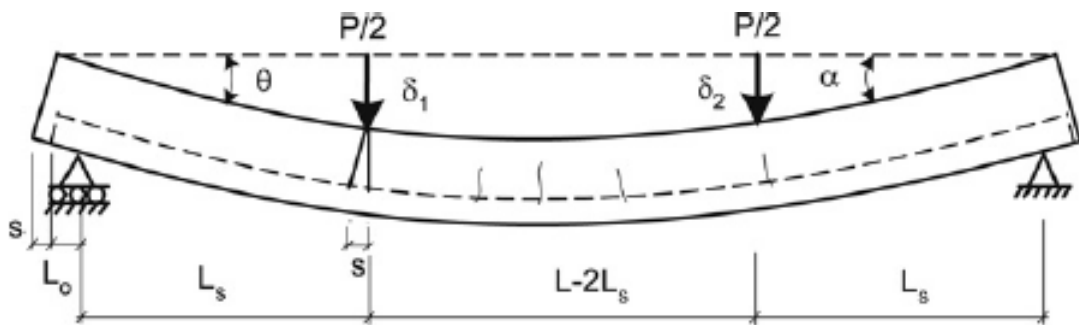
Slab under cracking at cracking mode (Abdullah and Easterling, 2009)
